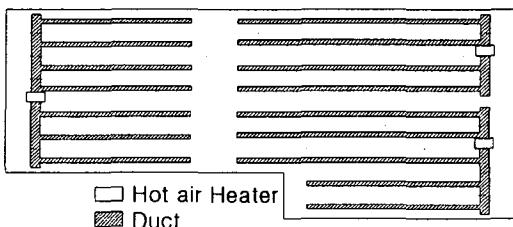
Arrangement plan of existing hot-air heater in declared greenhouse
